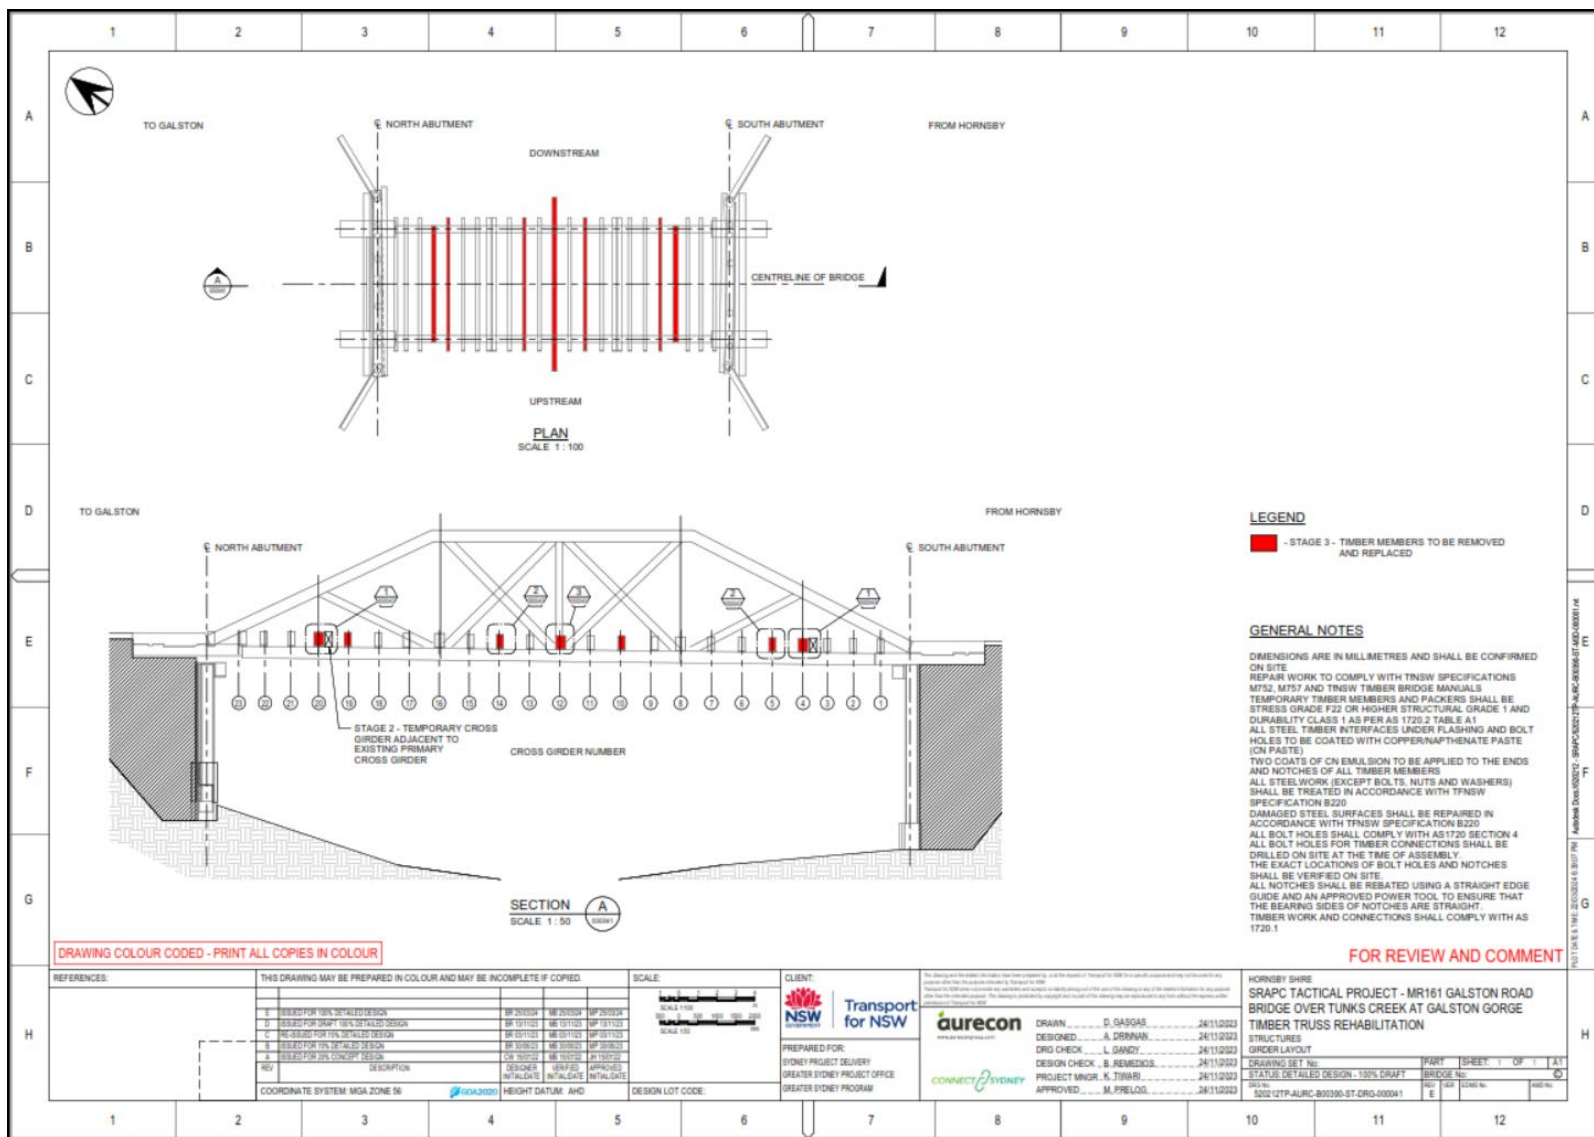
Structures girder layout: 520212TP-AURC-B00390-ST-DRG-000041 (Source: Aurecon)
